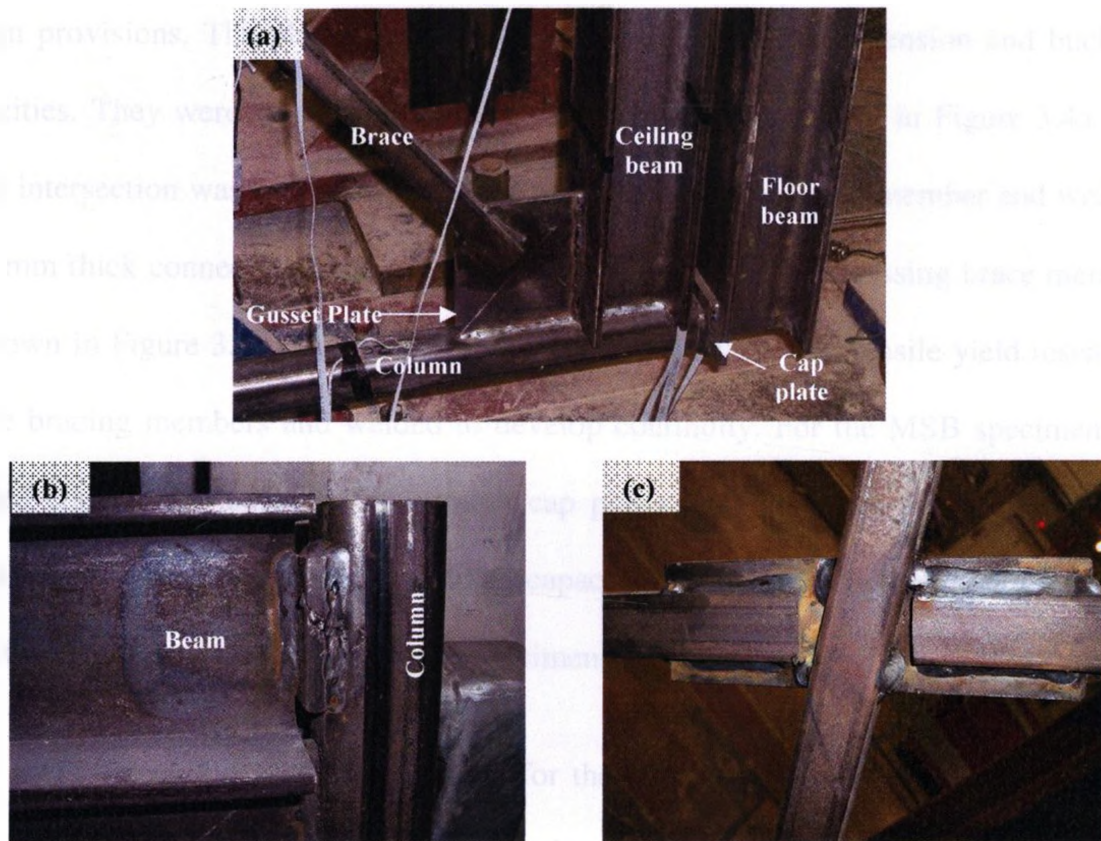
Photos of Specimens Member and Connection Details (a) MSB Frame (b) Beam-to-column Connection in Regular Frame (c) Brace Intersection
